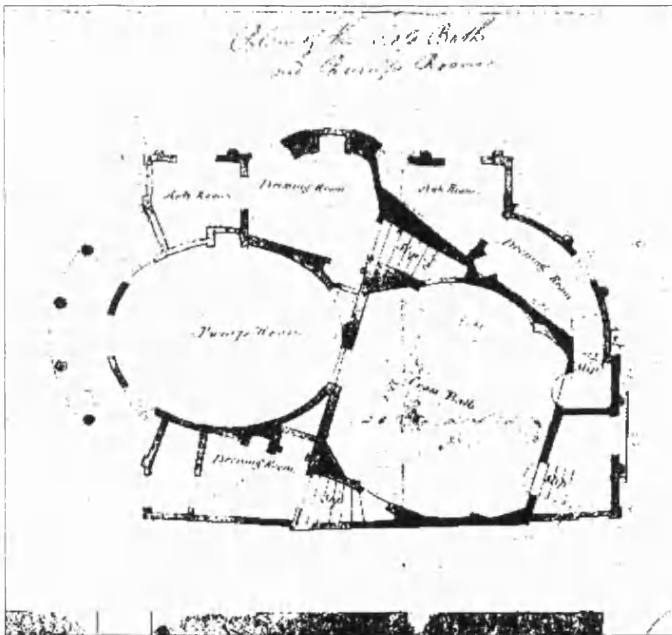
The Cross Bath. 1829 Inscribed in Manners's hand: 'Plan of the Cross Bath and Pump Room'. Survey as existing at same date as Sketch Plan (below left). This plan is therefore probably Baldwin's original layout. Biggs 801.
